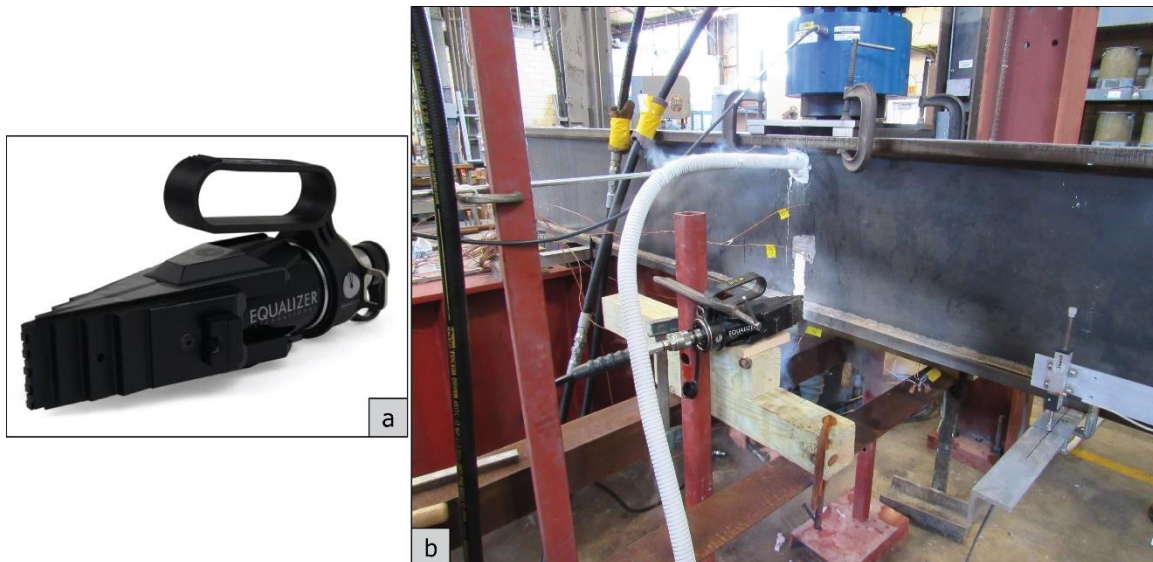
(a) SWi2025T hydraulic flange spreader tool, and (b) flange spreader tool installed on the bottom flange edge of the pilot specimen.
